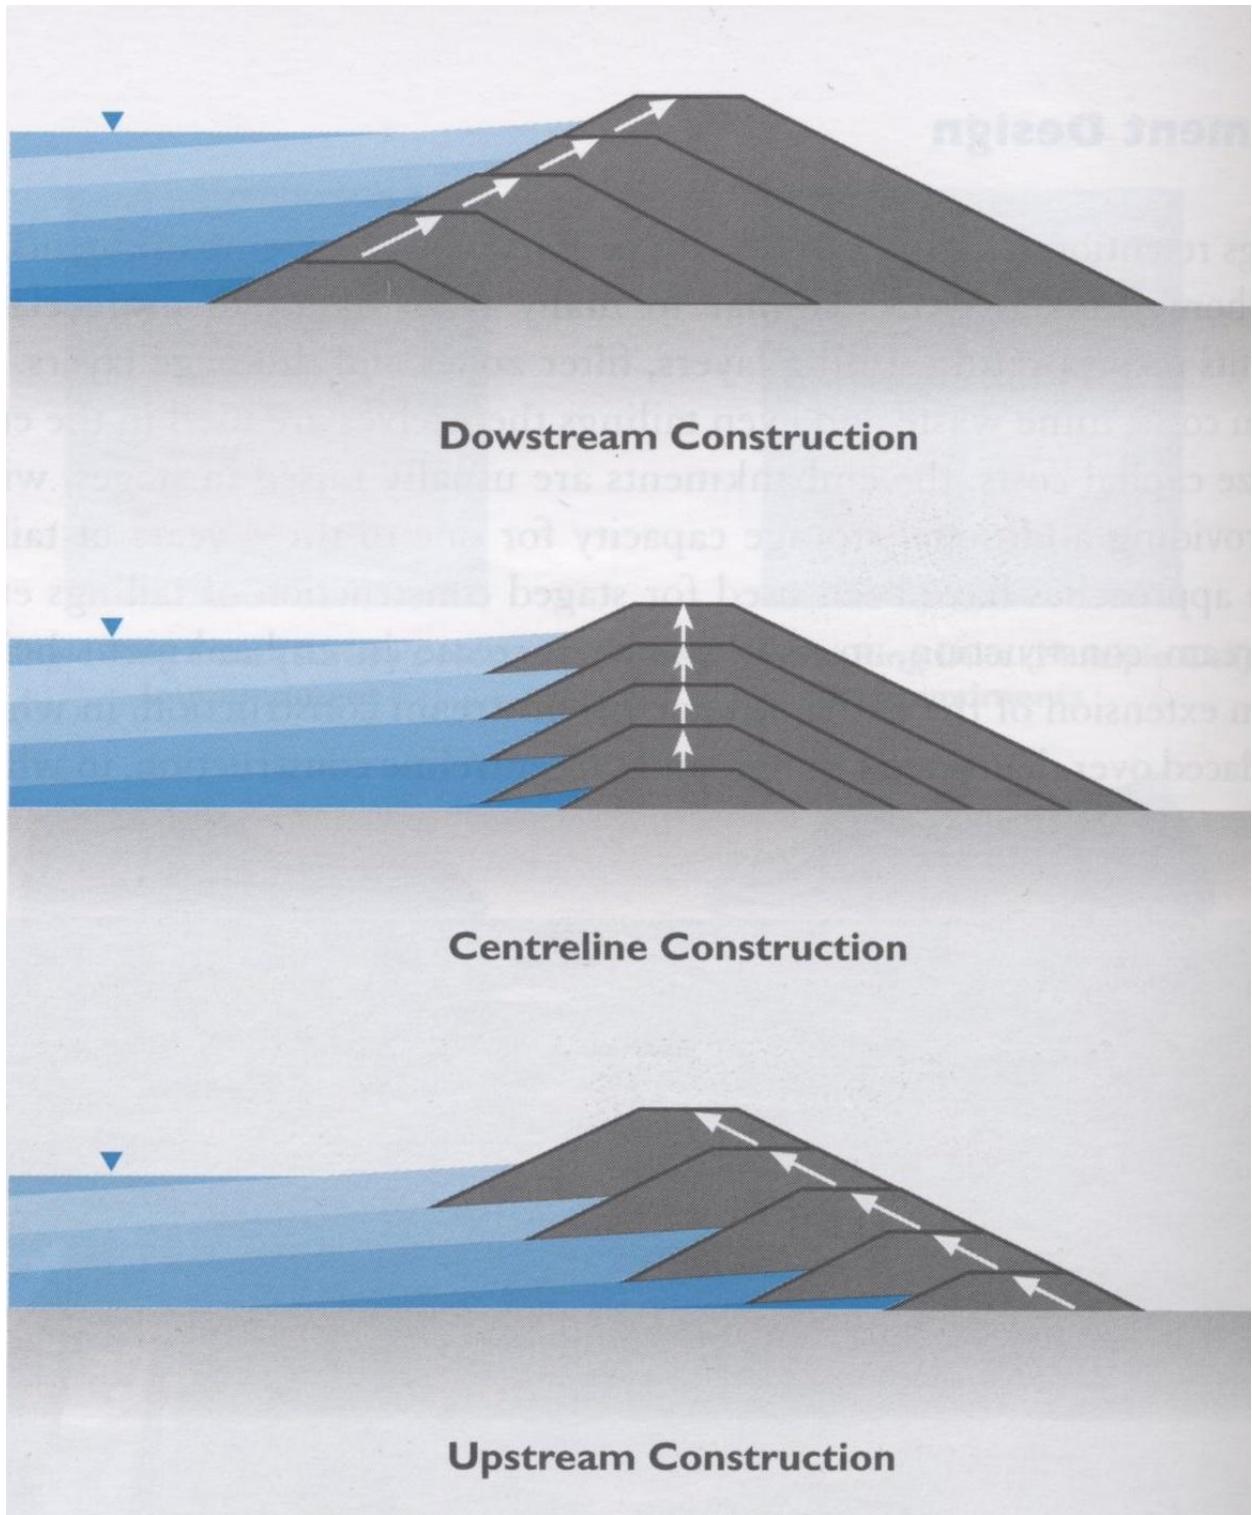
Tailings Dam Construction Methods (Spitz & Trudinger, 2009)
